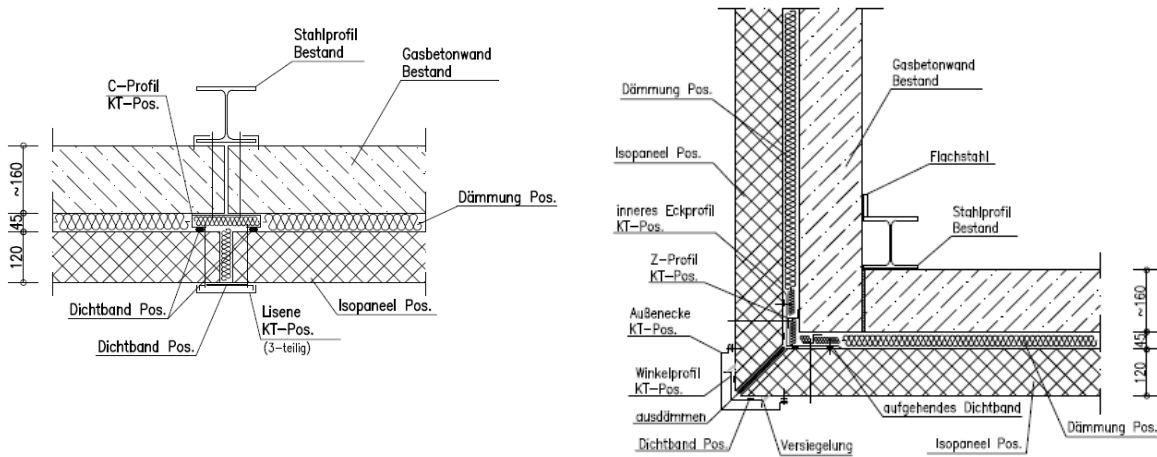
Use of steel sandwich panels for overcladding (left: regular section, right: corner)
